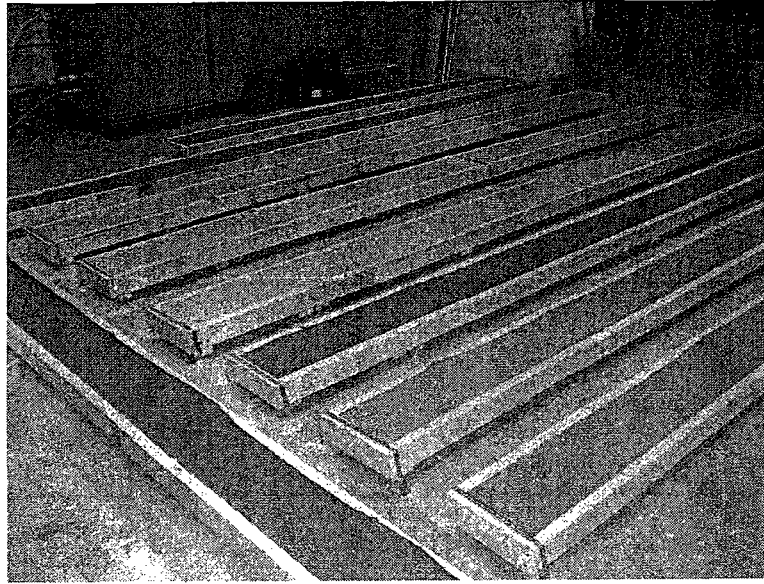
Wooden platforms that were prepared prior to construction of the specimens
